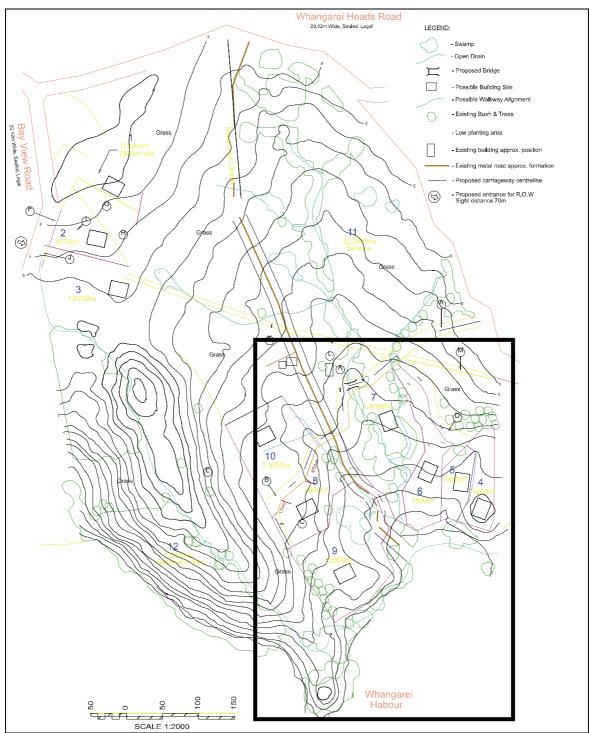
Plan of project area showing building plans (Courtesy Reyburn and Bryant Ltd). For inset area see Figure 13
